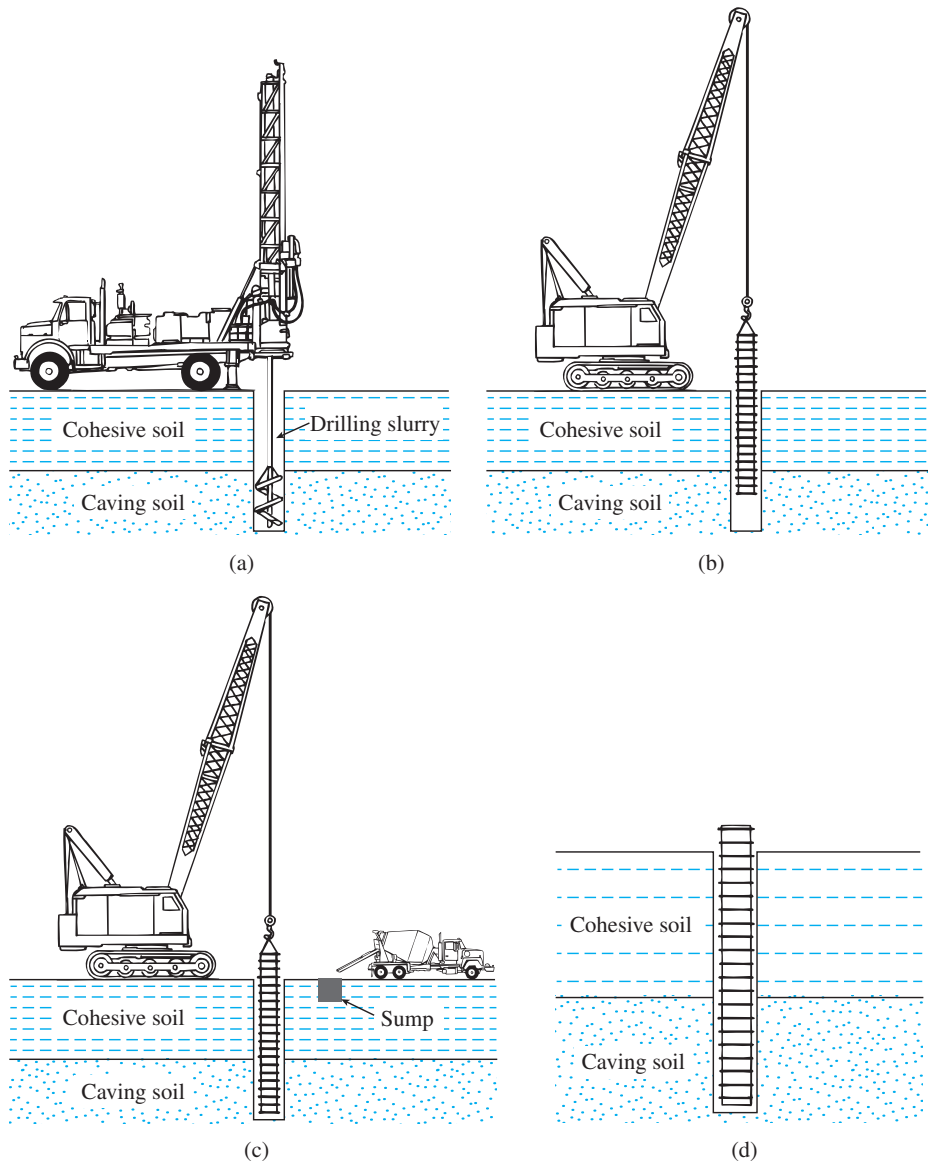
Slurry method of construction: (a) drilling to full depth with slurry; (b) placing rebar cage; (c) placing concrete; (d) completed shaft (After O’Neill and Reese, 1999)
